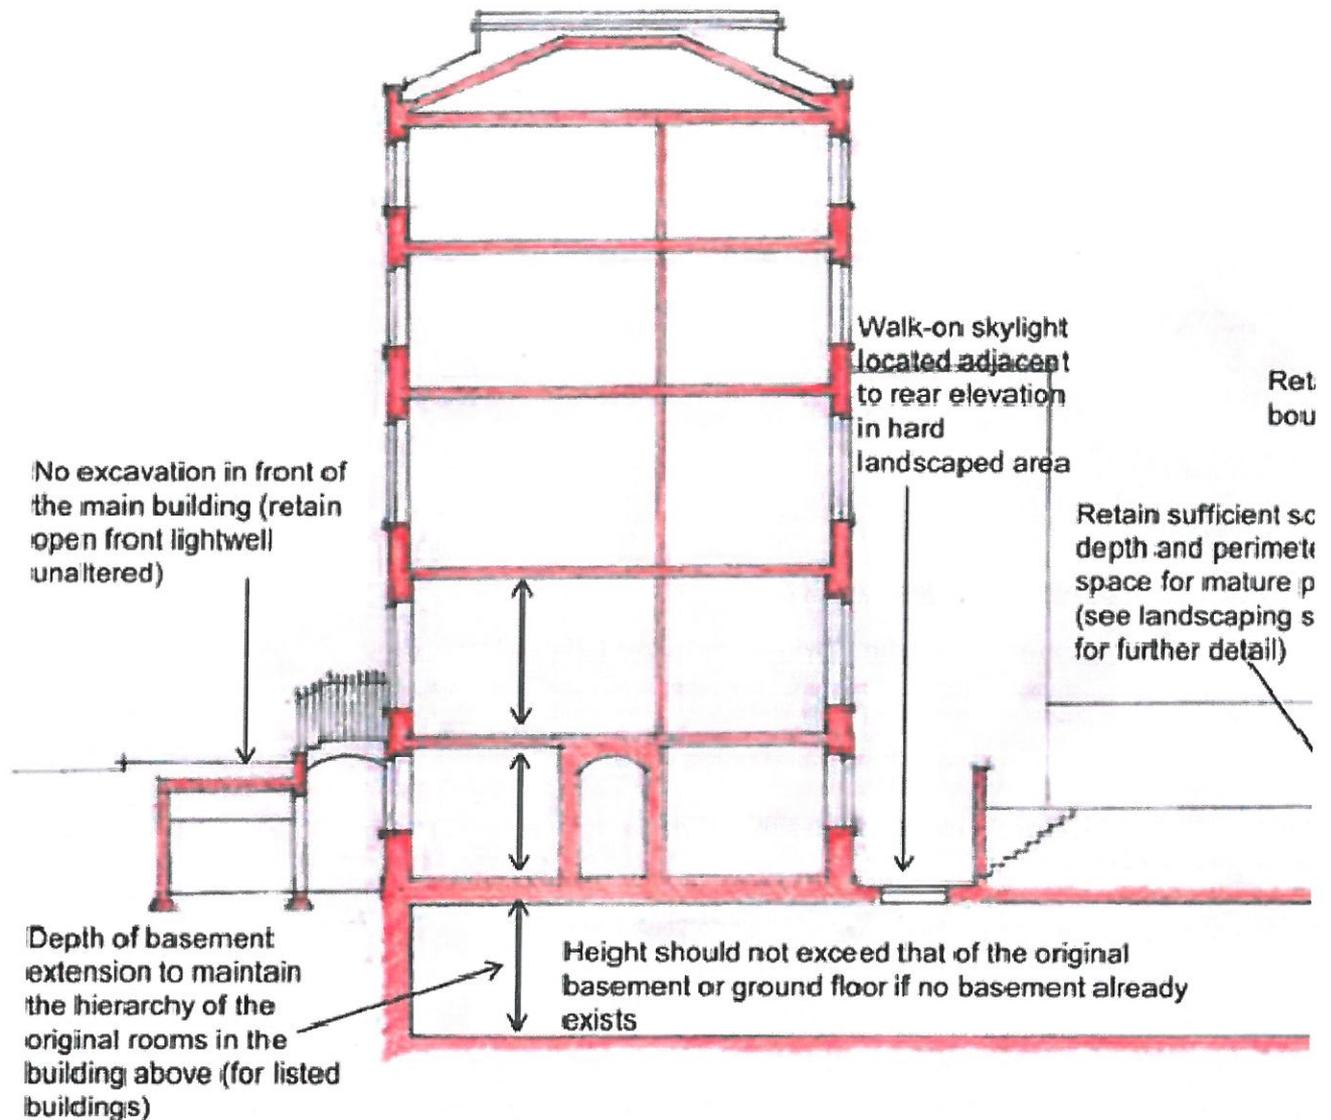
Best practice in basement design to typical terraced townhouse, with existing front lightwell
